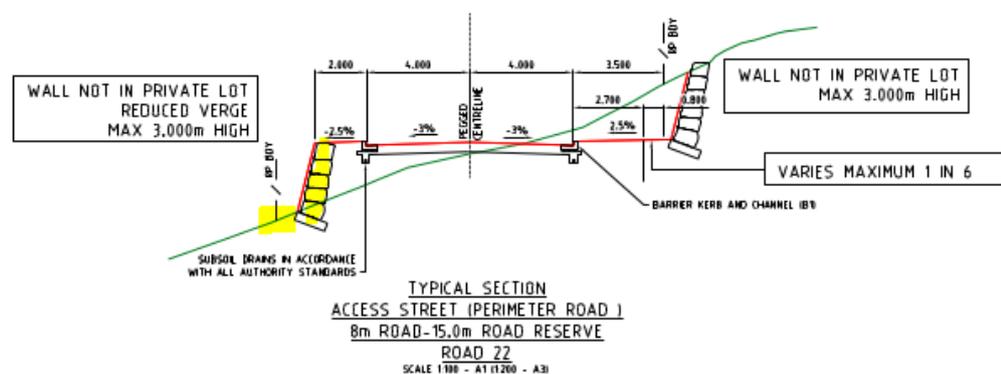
Extract of Typical Section Plan for Perimeter Road showing boulder wall
